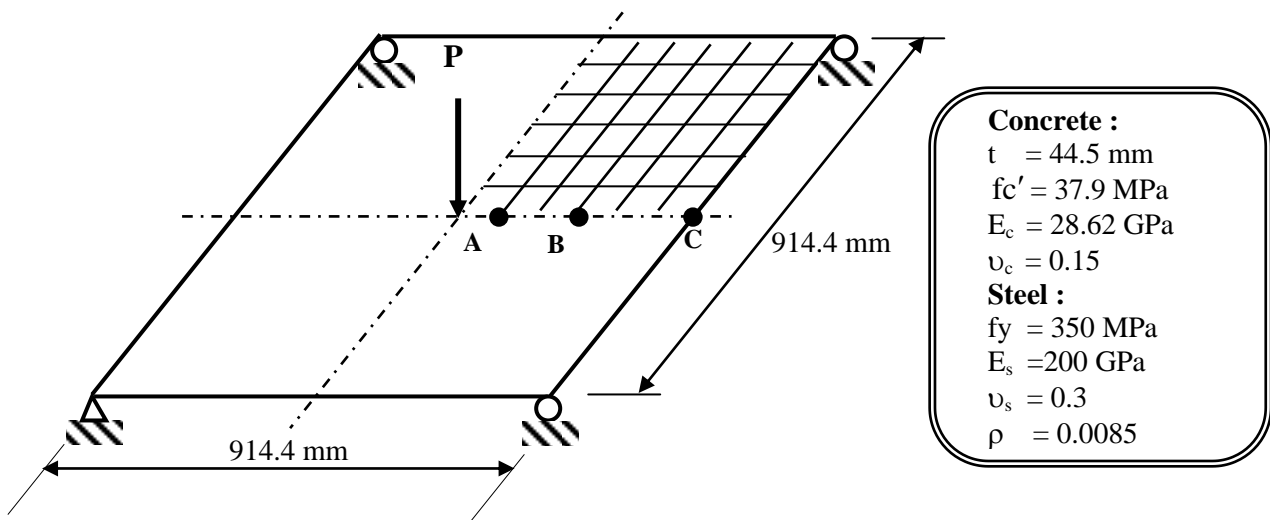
Schematic of corner-supported reinforced concrete slab tested by Jorfriet and McNeice (1971) [13]
